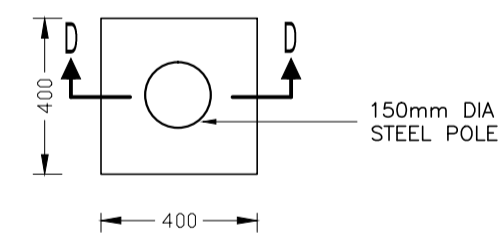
G: PLAN FOR FOOTING OF STANDARD POLE
